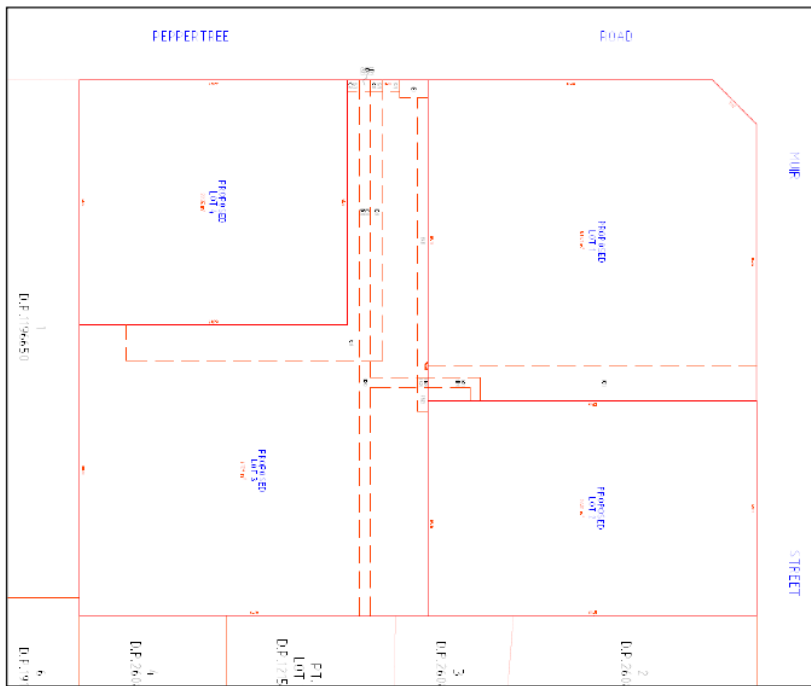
Approved plan of Subdivision (DA16-2019-445-1) identifying the subject site as proposed Lot 1.
